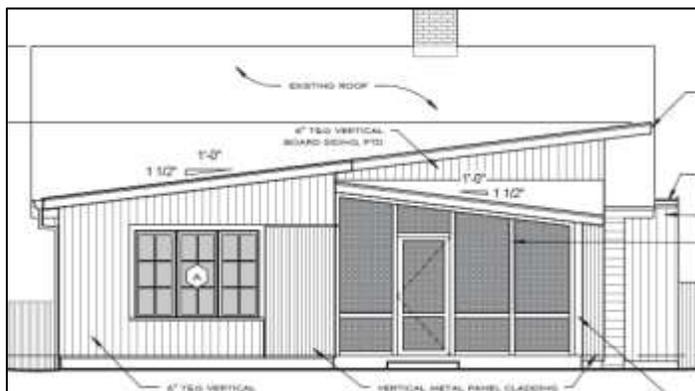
Rear view of the proposed addition, showing the asymmetrical roof
